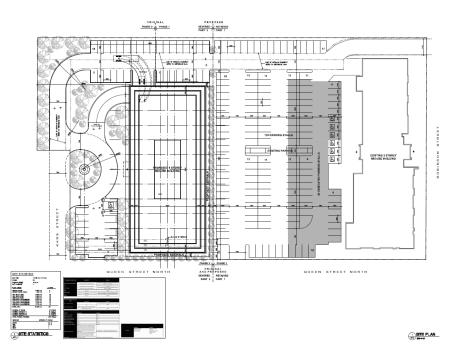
Subject lands showing the proposed 8-storey development and the 3-storey office building.
